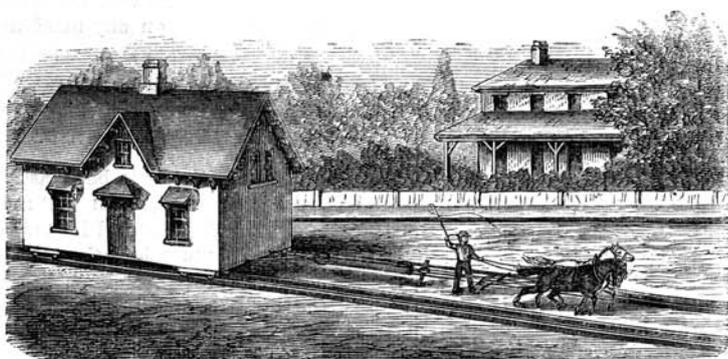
THE HOUSE ON ITS TRAVELS.
